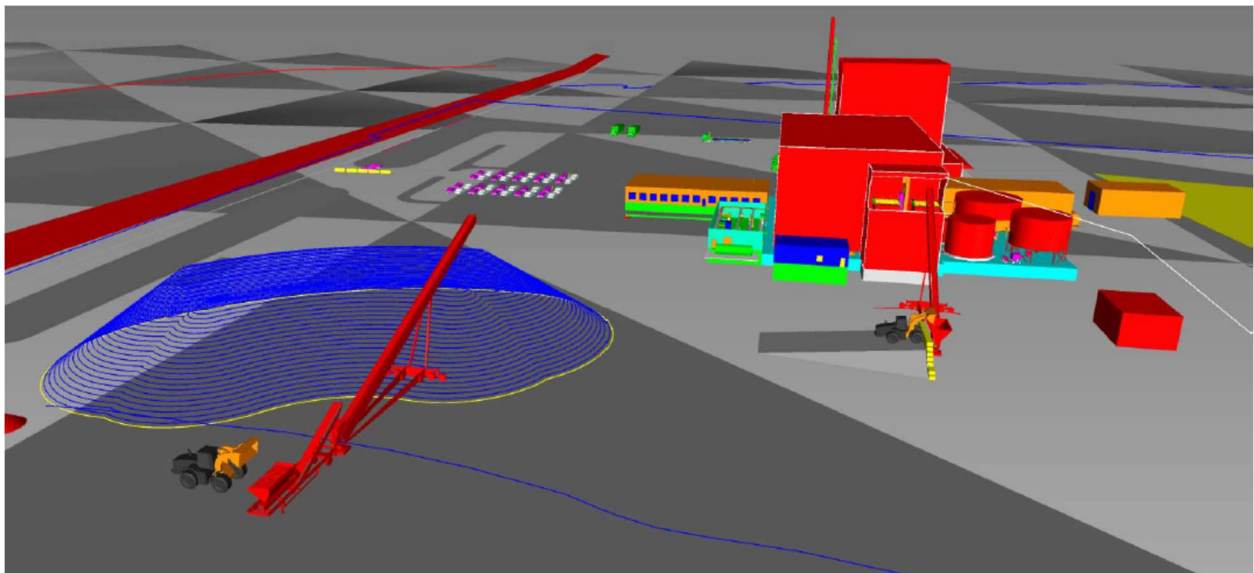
Buildings and Ore Stockpile View, Looking Generally South
